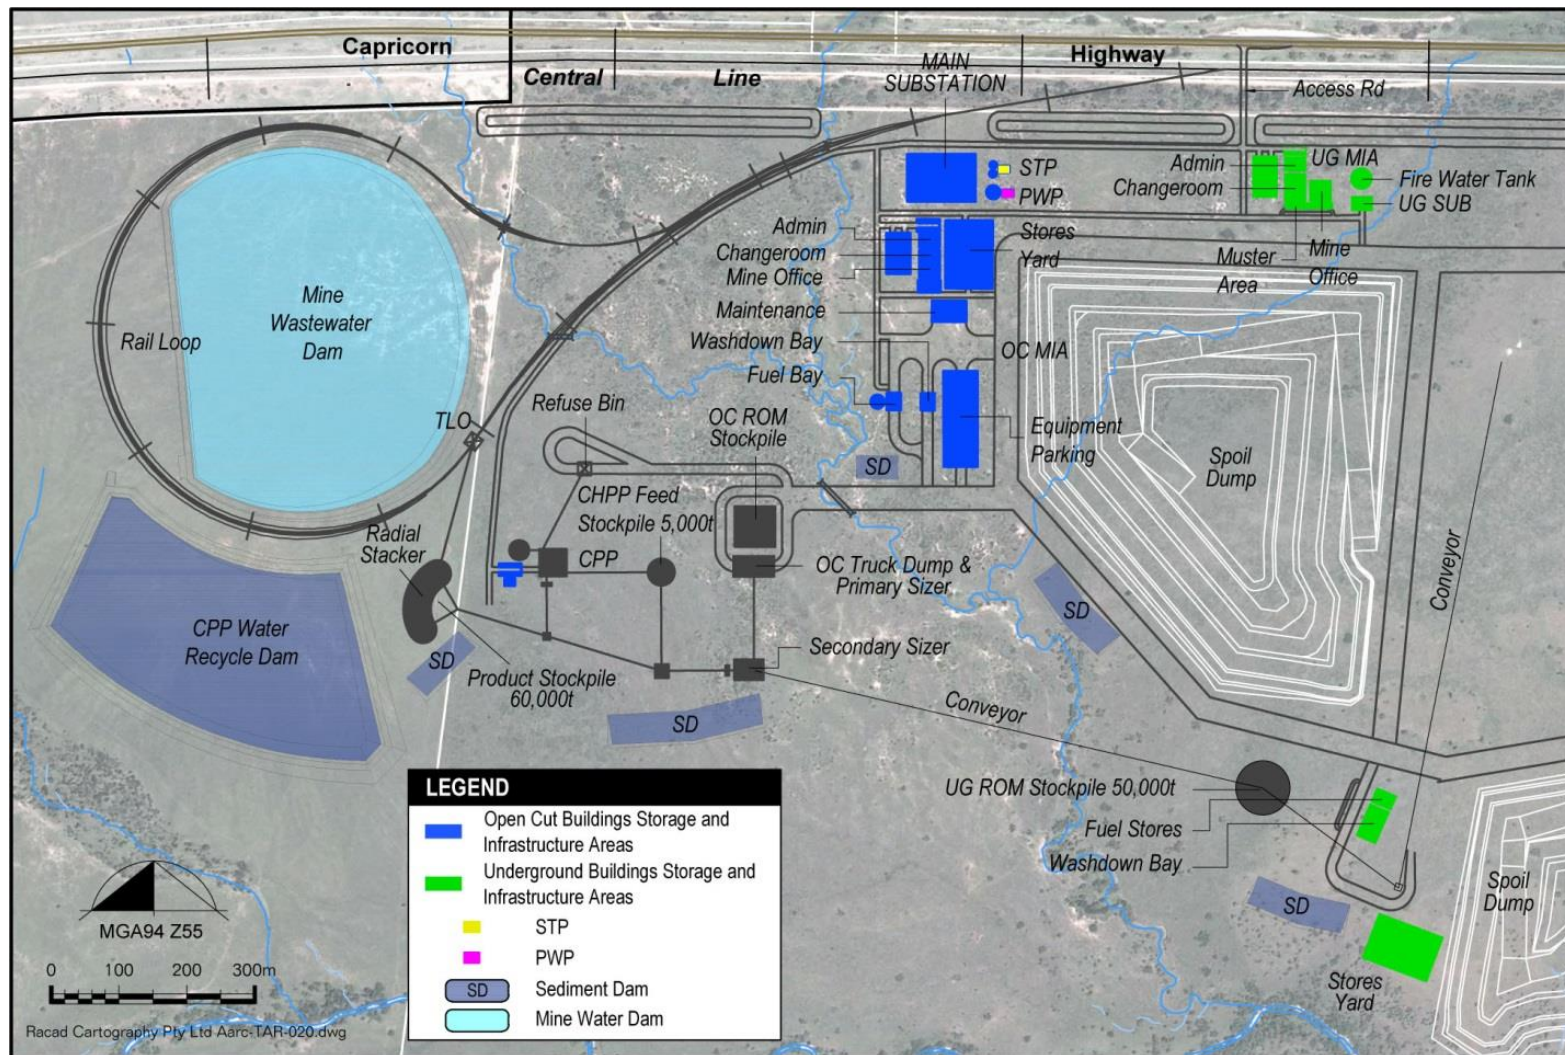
Project Buildings, Storage and Infrastructure Areas
